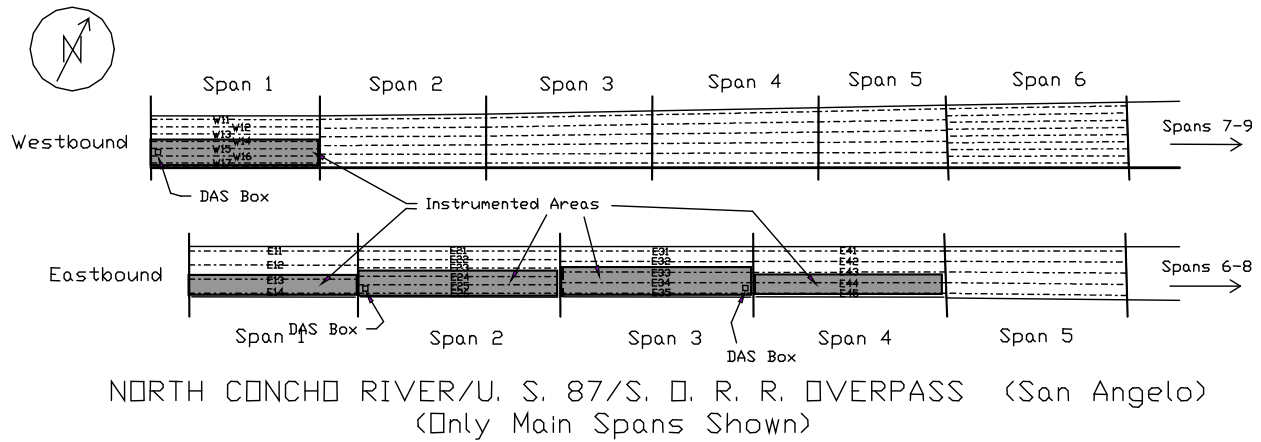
Instrumented Areas of San Angelo Bridges [10]
